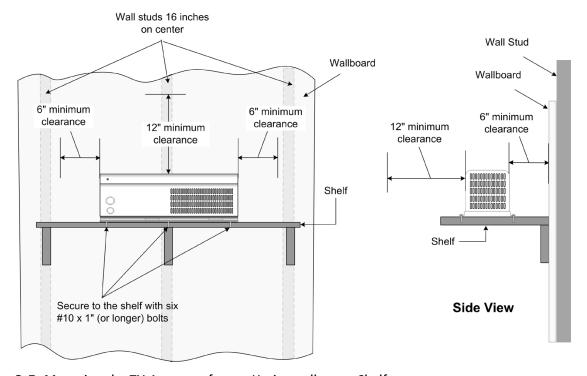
Mounting the TX Autotransformer Horizontally on a Shelf
